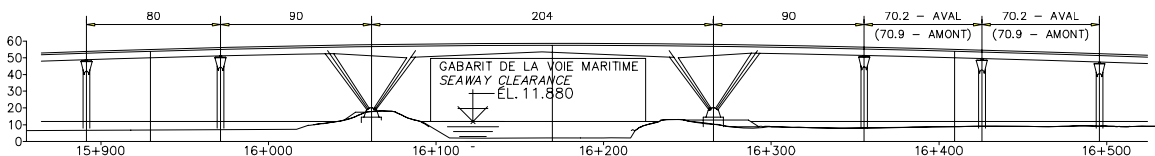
Cross-section- Mixed frame bridge with V-shaped piers – Twin-beam
